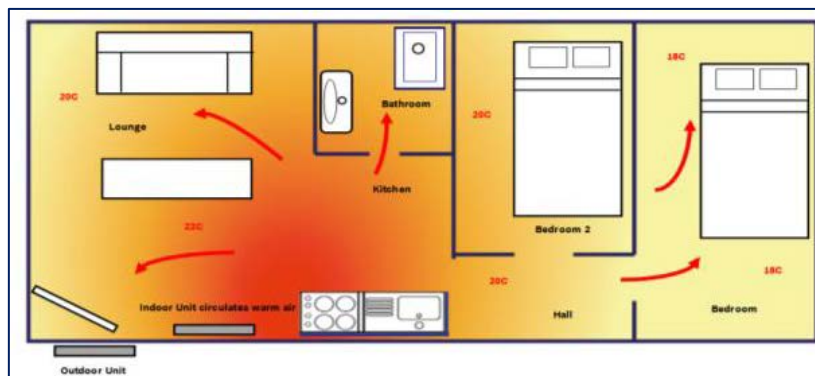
Floor plan for Park Home reference T-02 from Worcester Bosch heat pump specification
